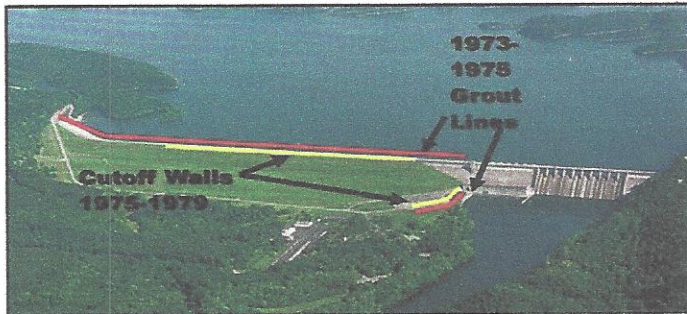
Generalized alignment of the 1973-1975 grout lines (red) and cutoff walls (yellow), installed 1975-1979 (Source: USACE)
